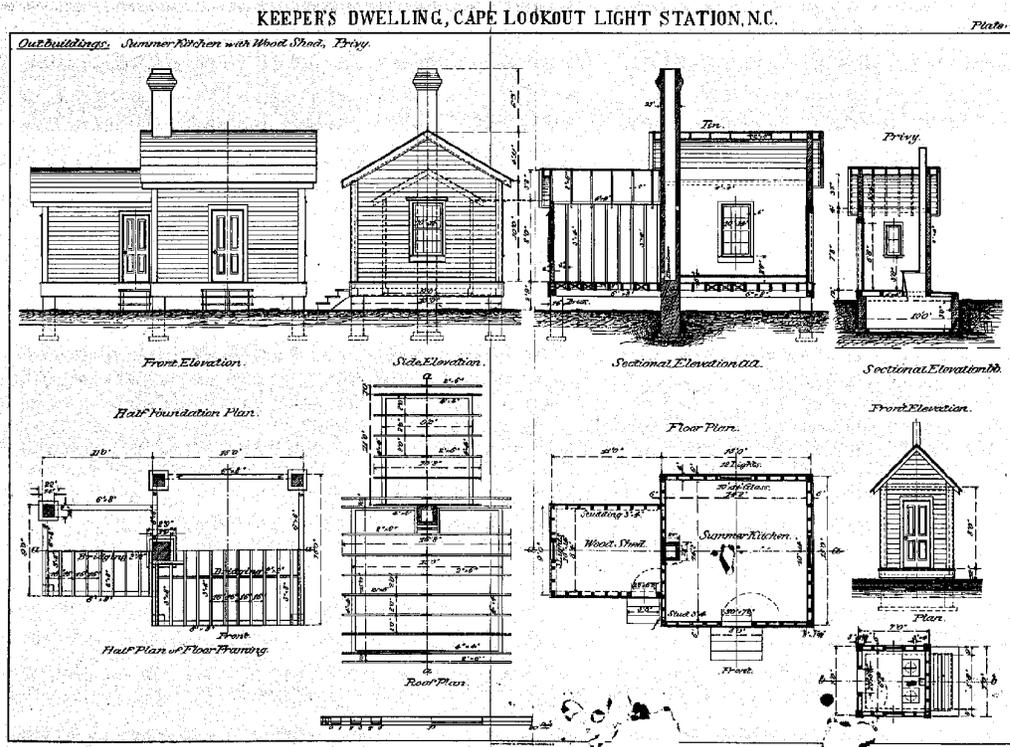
Original plans for summer kitchen and privy. (U.S. Coast Guard, 1907)
